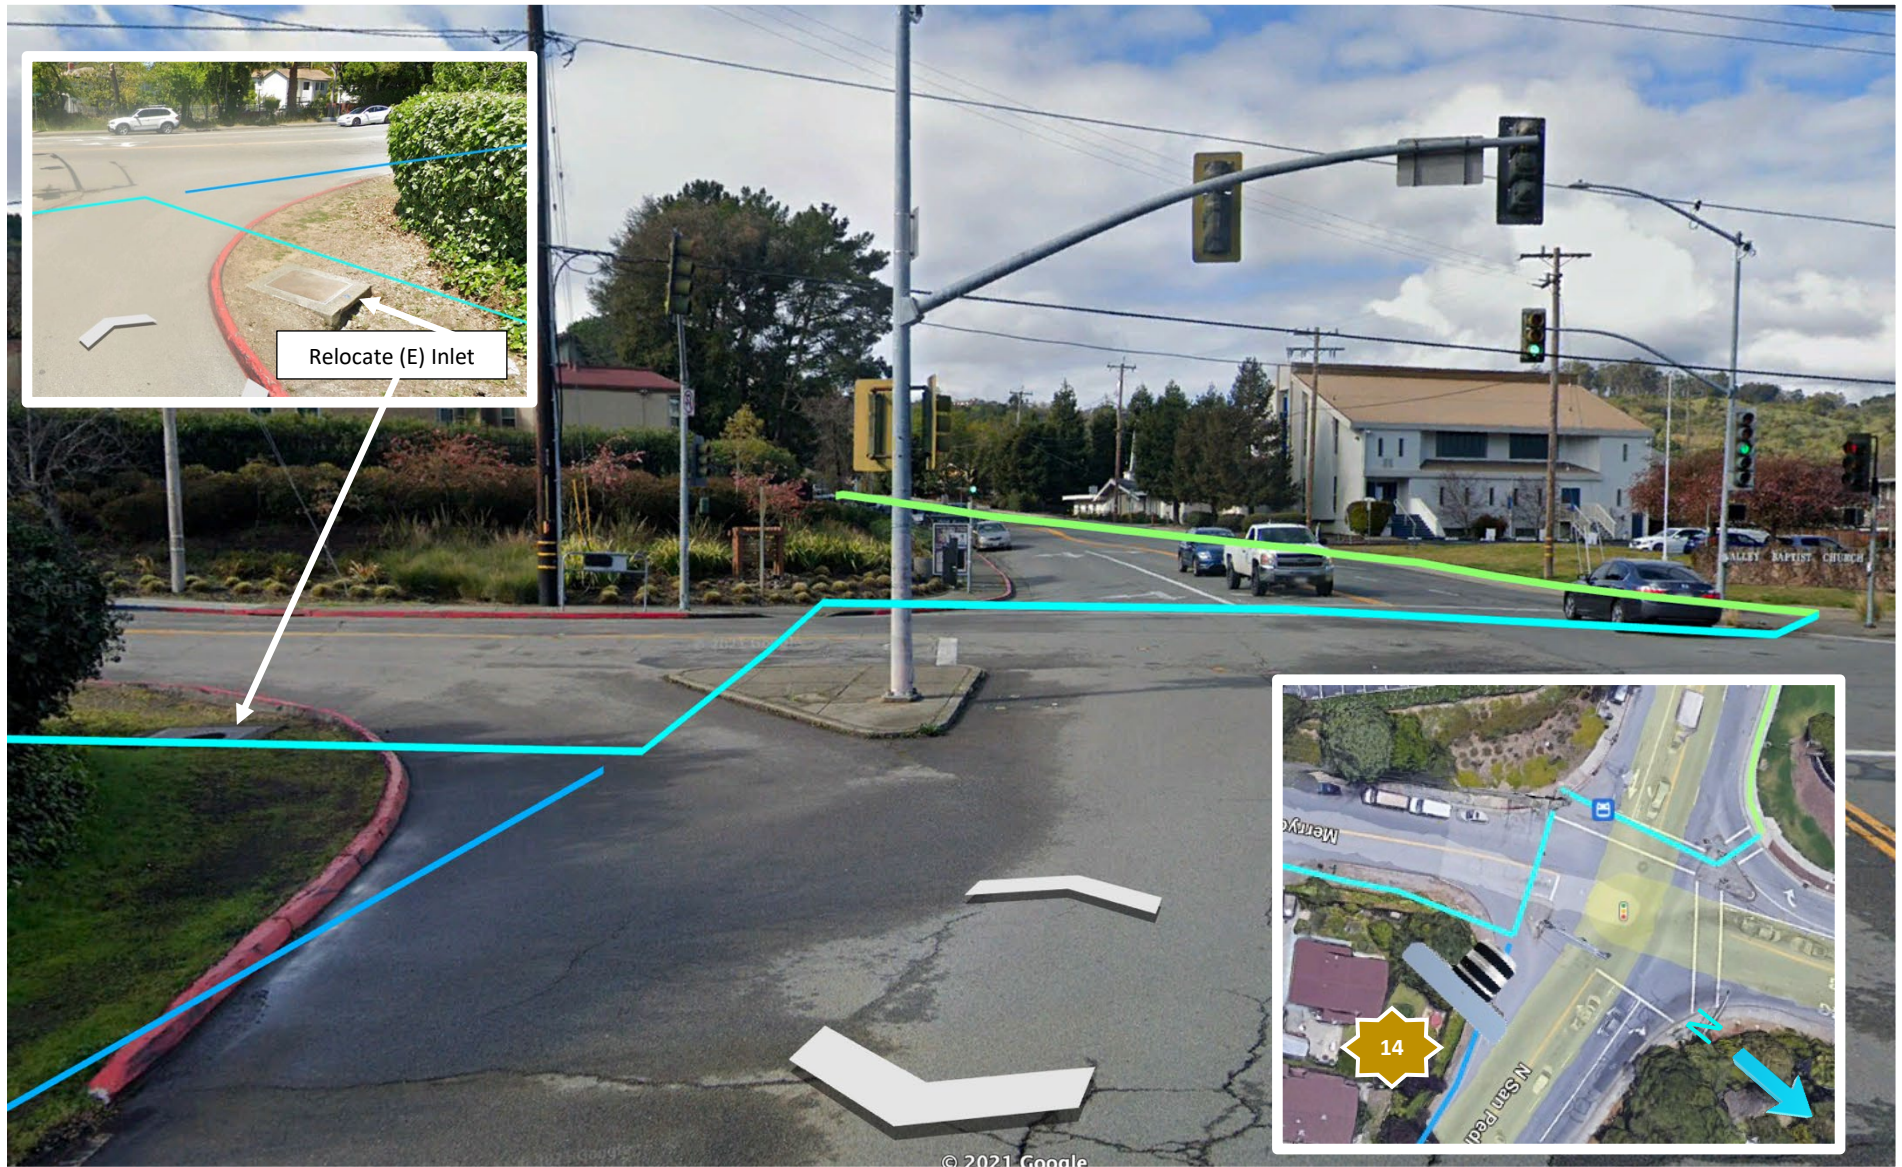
Cyan Segment – Looking West on North San Pedro at Merrydale
